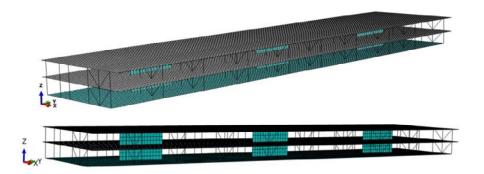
Building III A conventional building system in Norway; common school or other cultural institution building.
